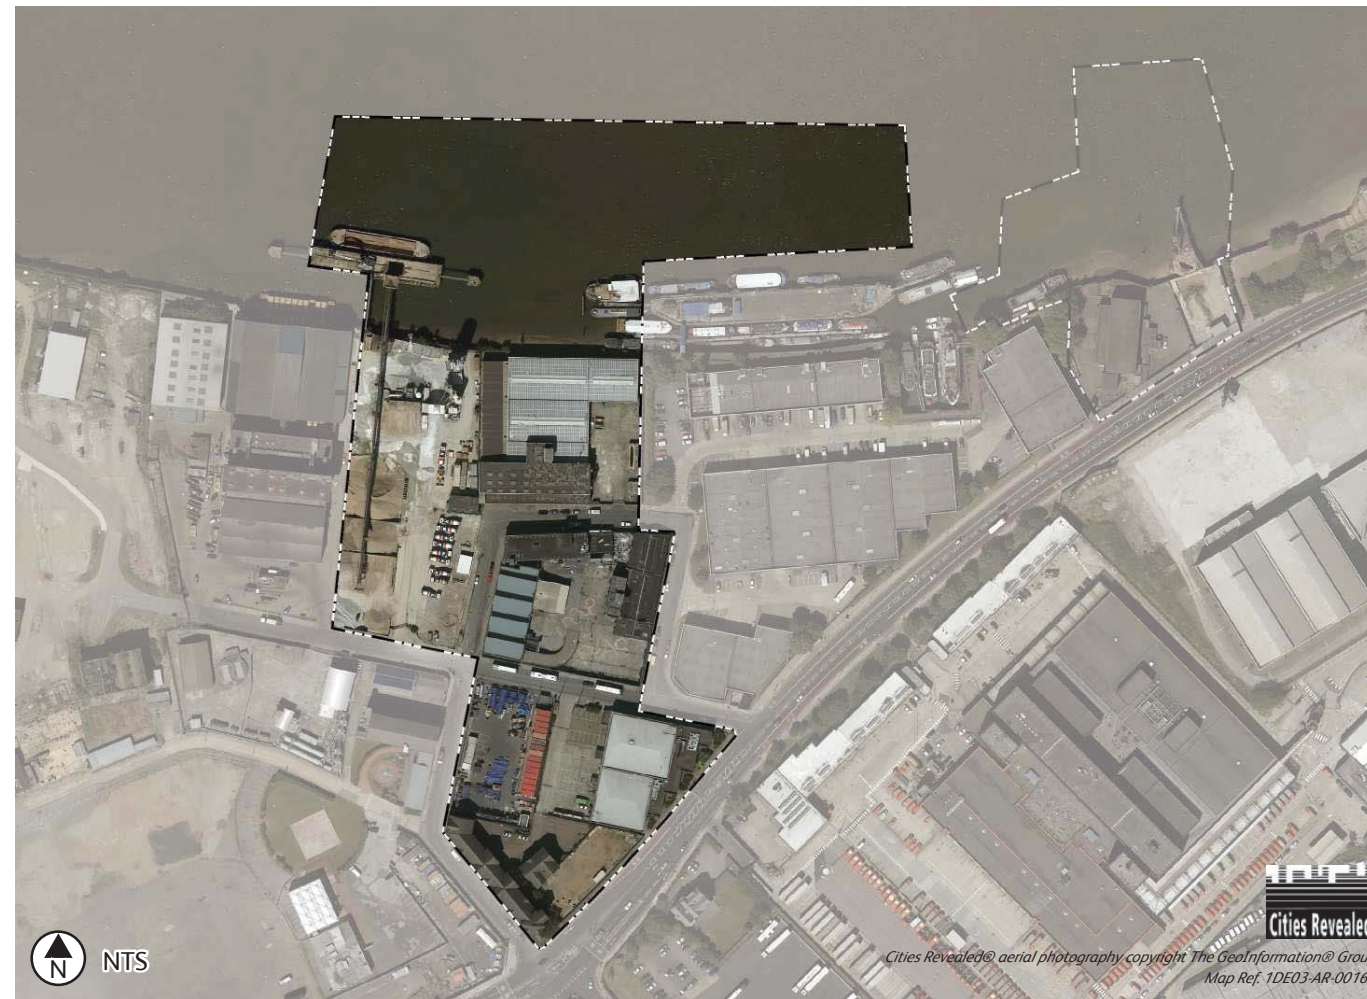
Aerial photograph of the existing Kirtling Street site with LLAU indicated
